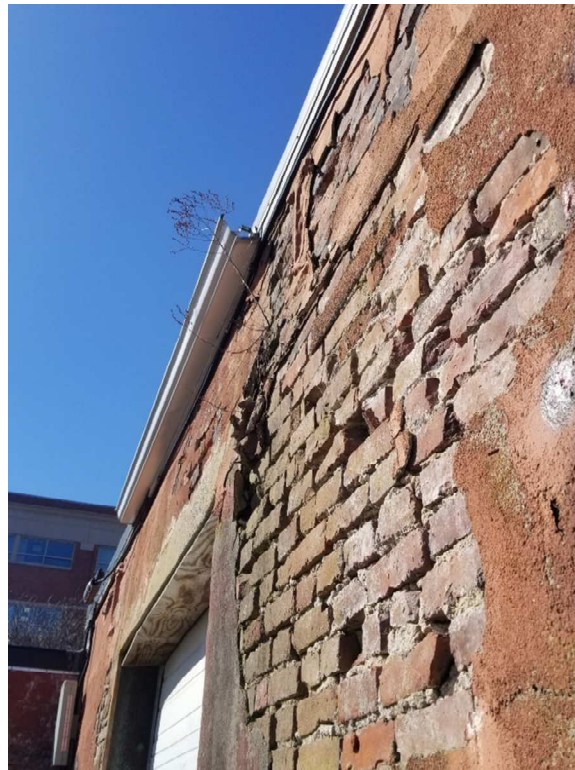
Water intrusion at the front of the building, adjacent to 121 Union street.
